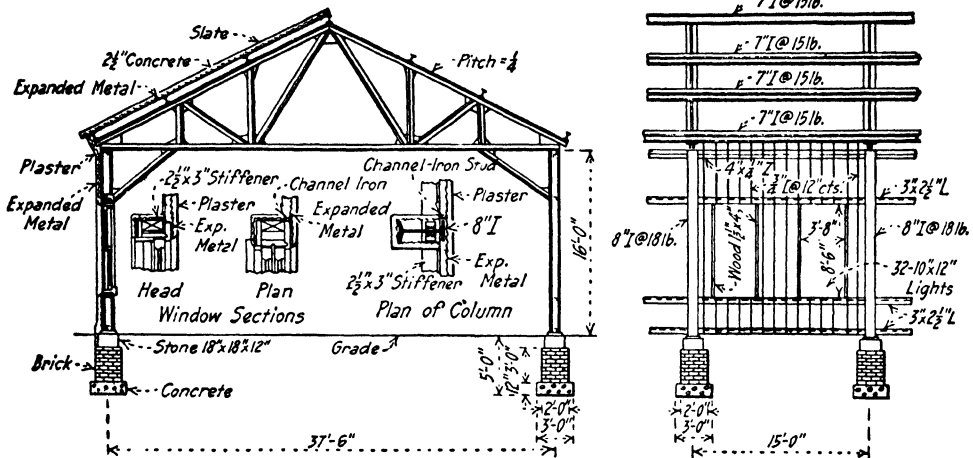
STEEL FRAME BUILDING WITH PLASTER WALLS.
